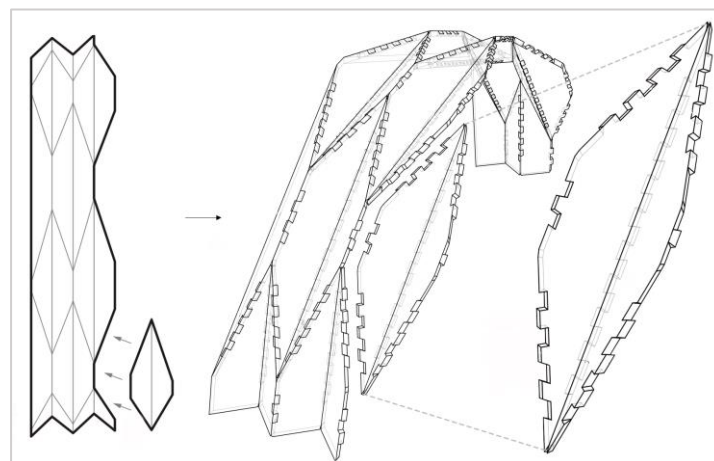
Example of folded plate structures. The Figure shows a folded plate structure with dovetail joints, which does not use additional fasteners, as developed Robeller et al., as noted by Weinand [5].
